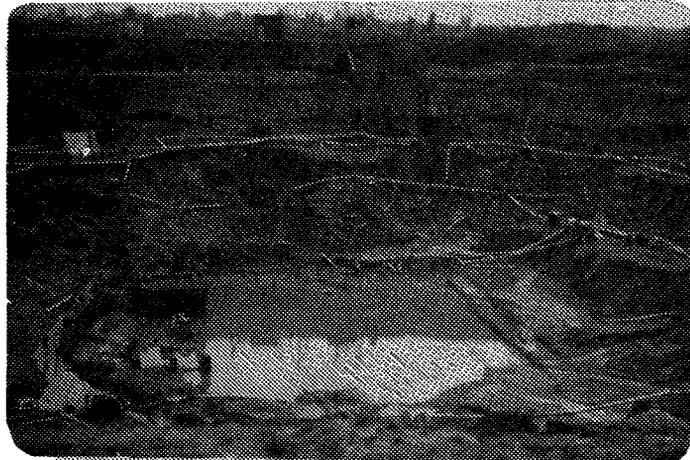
A VIEW OF THE EXCAVATED PIT FOR THE UNDER-GROUND POWER HOUSE ALONGWITH THE LOADING PLATFORM FOR IN-SITU LOAD TEST
